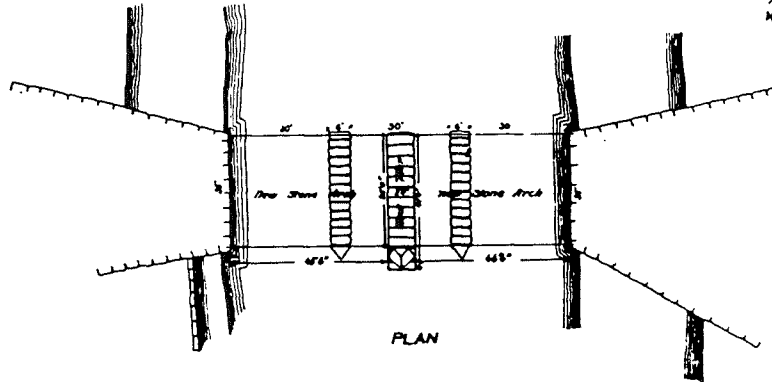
"Plan Showing Proposed Extension of Green Street, Ipswich Mass. across Ipswich River." C.A. Putnam, CE, Salem, June 7, 1880. Shows drawbridge not as built.
